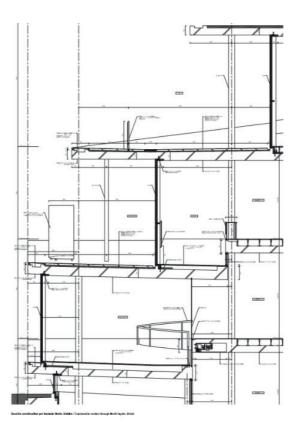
Detailed sections, New Library, SANAA (2019) • Source: El Croquis
